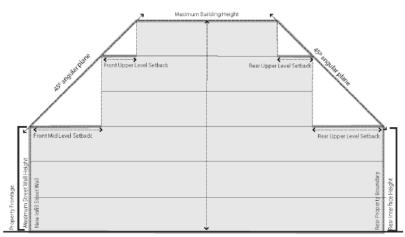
Building envelope requirement – Infill Building (Figure 2 in Schedule 15 to Clause 43.02 Design and Development Overlay).
